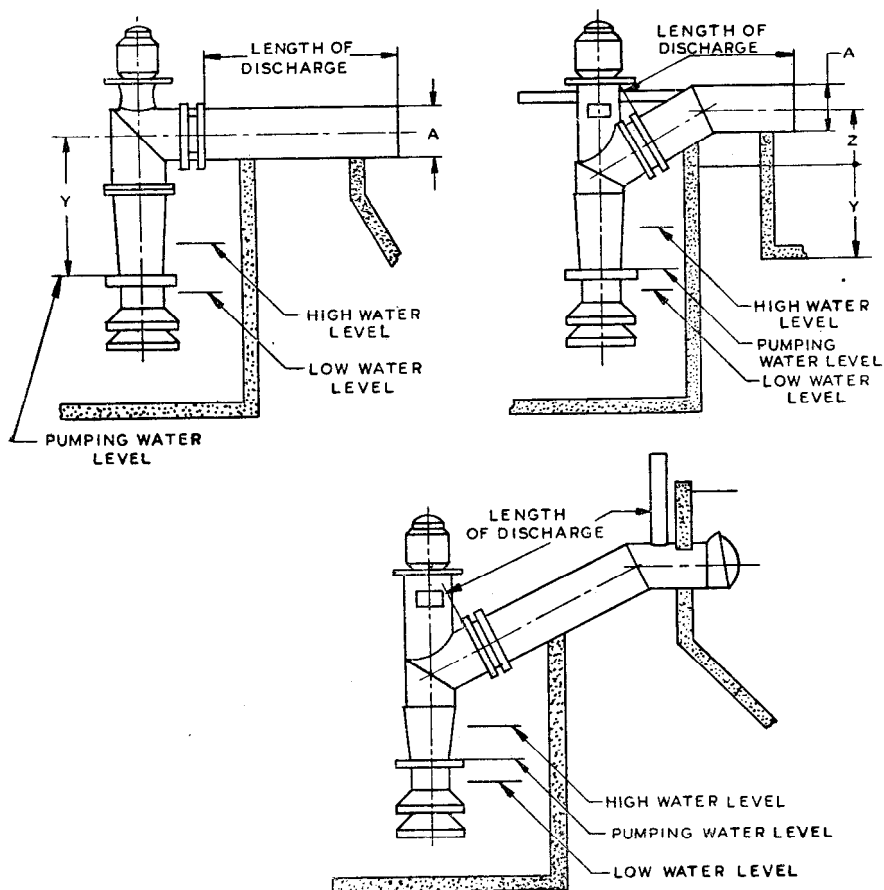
TYPICAL DRAINAGE PUMP INSTALLATION — *Contd
